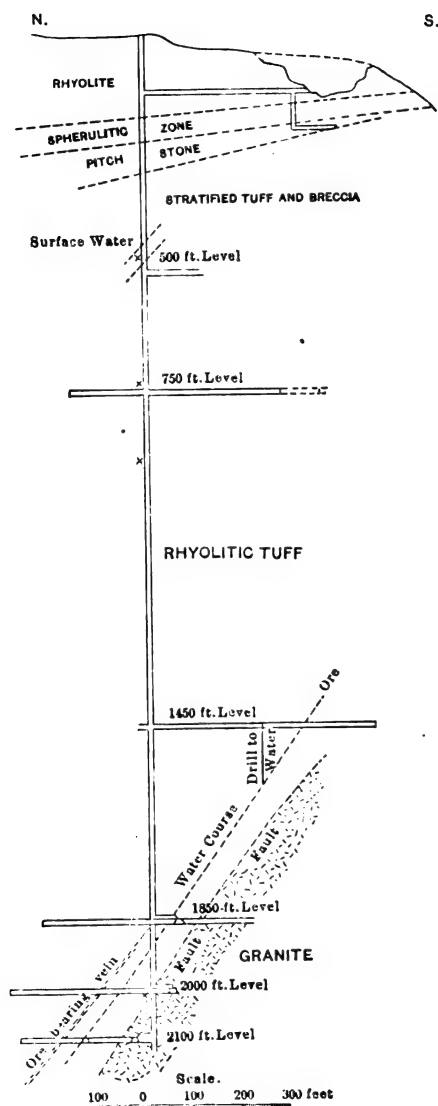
SECTION THROUGH GEYSER SHAFT.
